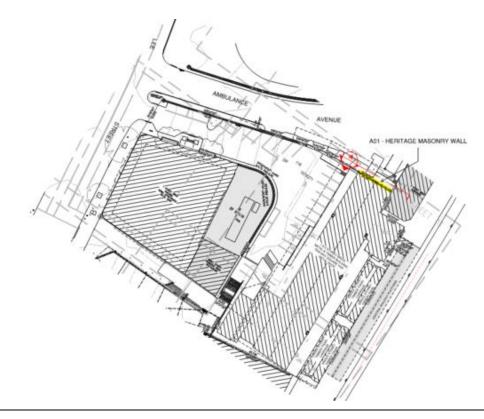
Plan View of Heritage Masonry Wall on Ambulance Ave
